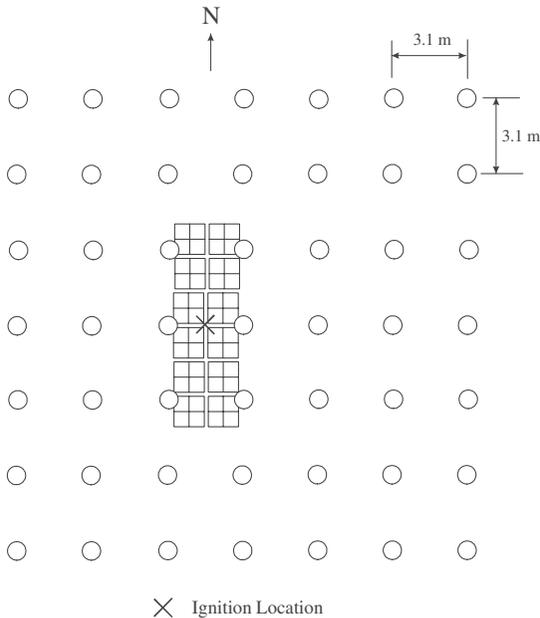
A plan view of the sprinkler layout relative to the storage array used in Test 4. The test was conducted under a 10.7-m (35 ft) high ceiling. The branch lines were in the east-west direction.
